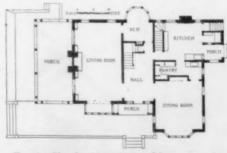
Plan showing projection of dining room wing Floor area 1,385 square feet, exclusive of porches
